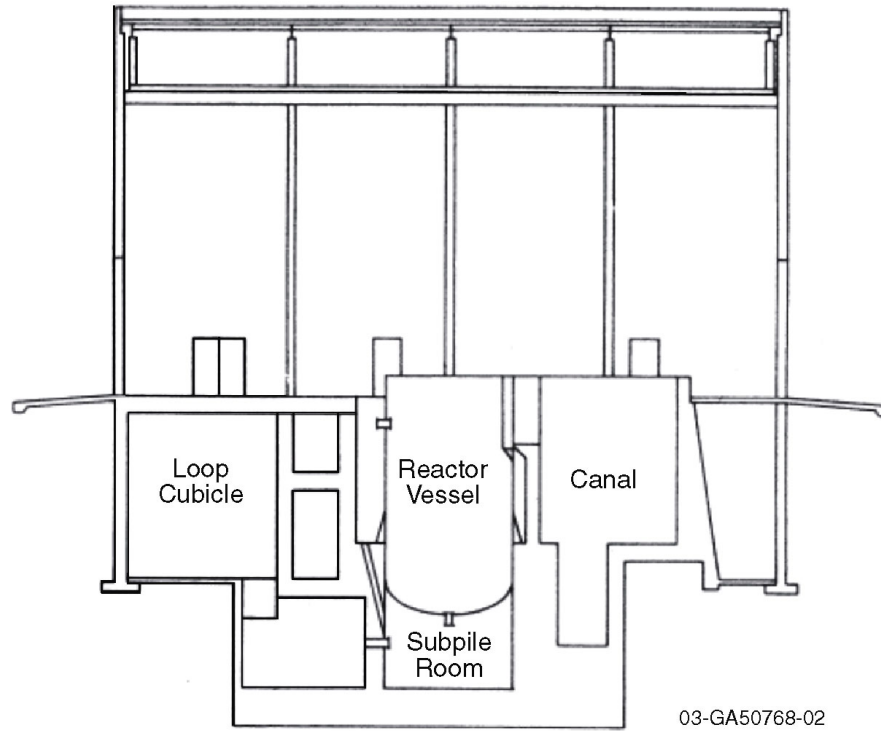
Power Burst Facility reactor building (PER-620) elevation looking east.
